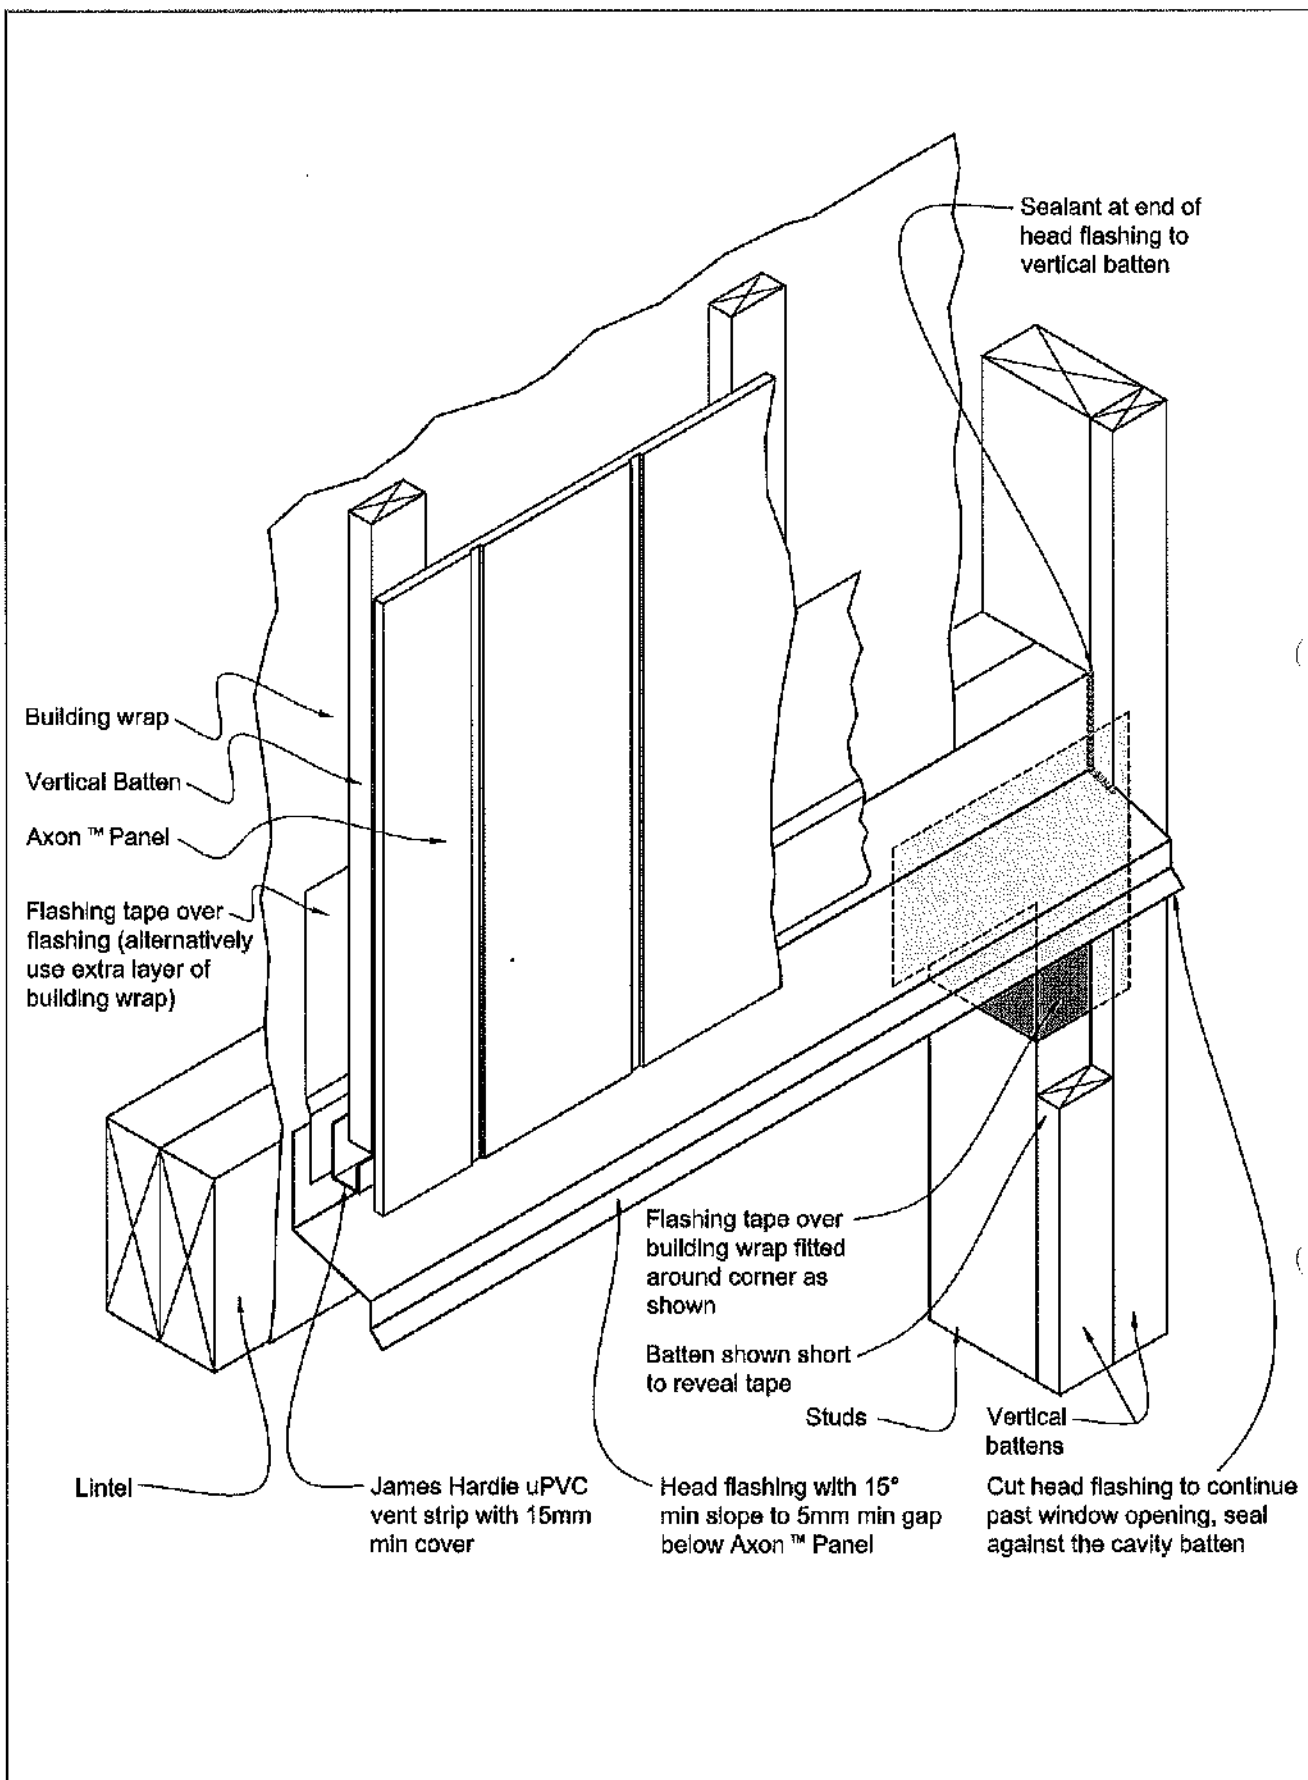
ALTERNATIVE HEAD FLASHING TERMINATION AGAINST BATTEN
